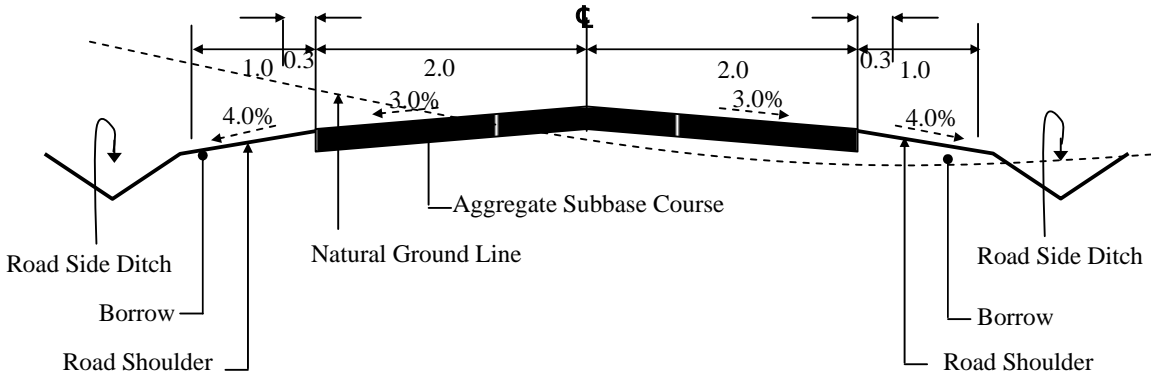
Typical Cross-Section of a Two-Lane Earth Road
